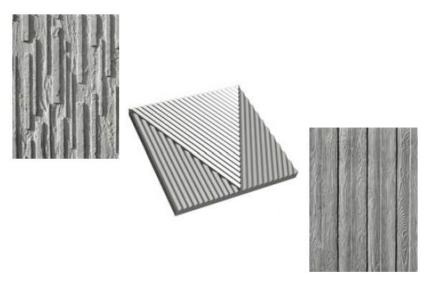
Concrete front facing panels (Maccaferri, 2010)
